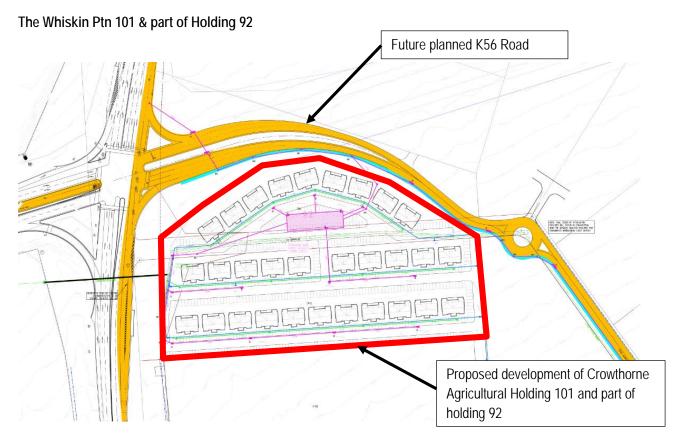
Layout Plan indicating the proposed development in relation to the future planned K56 Road (under separate Application)
